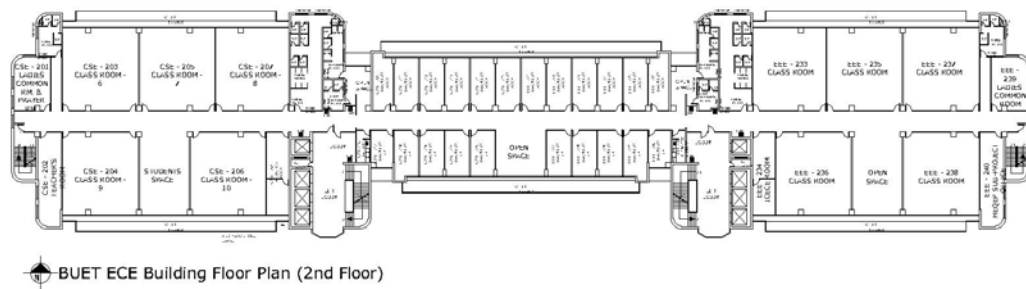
BUET ECE Building Floor plan (2nd Floor)
